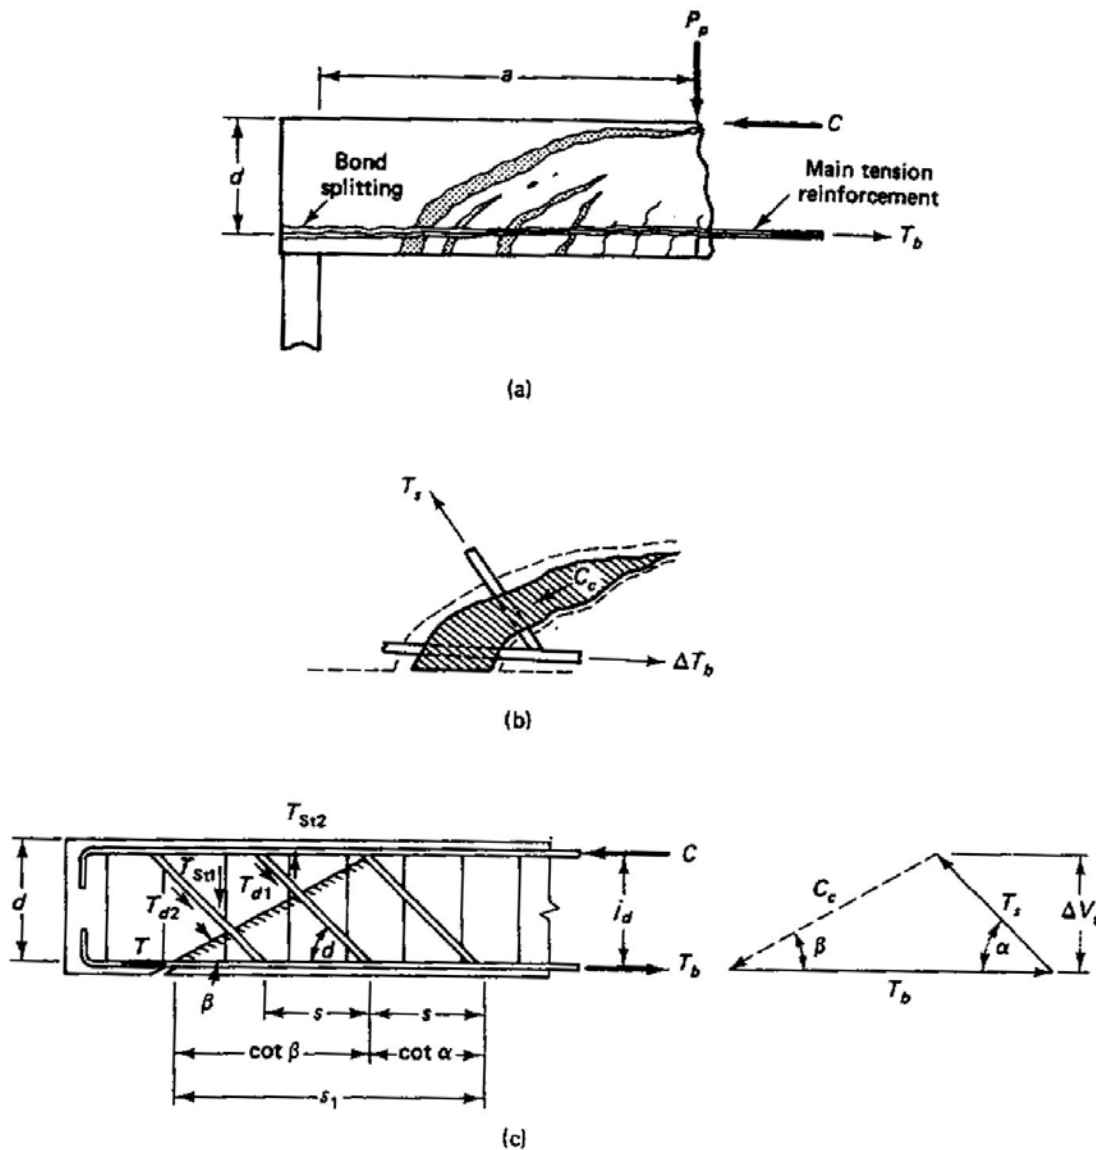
Diagonal tension failure mechanism. (a) Failure pattern. (b) Concrete simulated strut. (c) Planar truss analogy.
